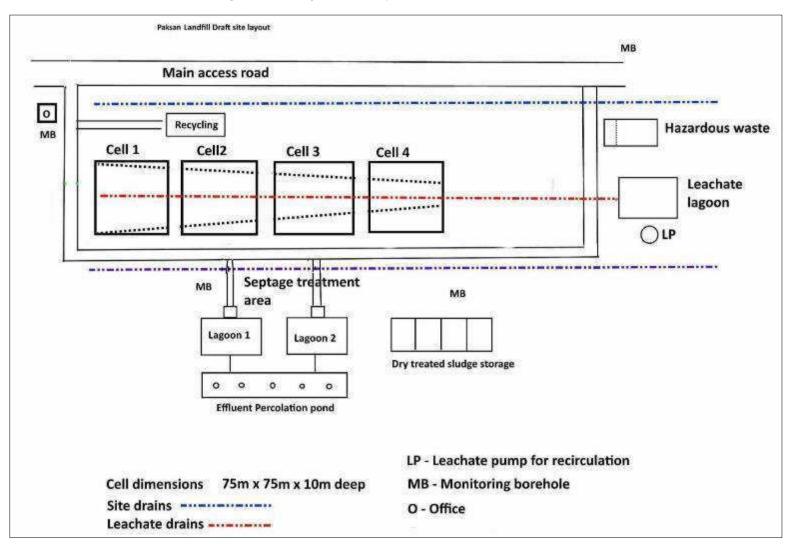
Layout of Proposed Pakxan Contolled Landfill
